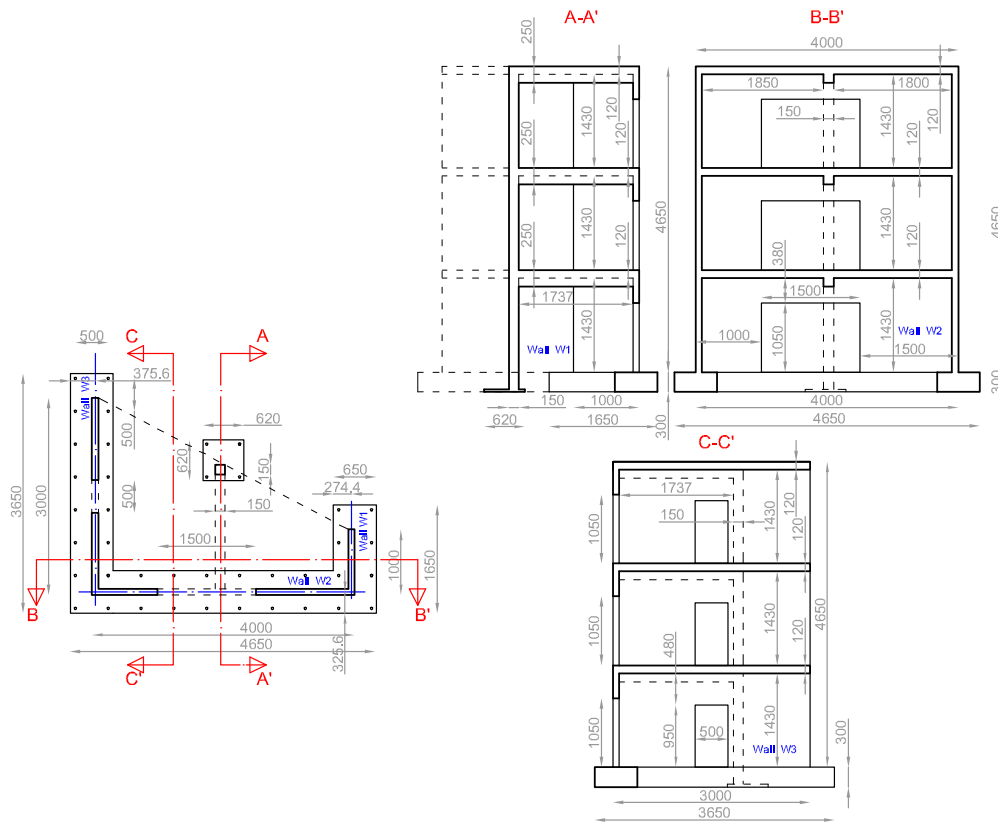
Sketch of the specimen geometry — dimensions in millimeters.
